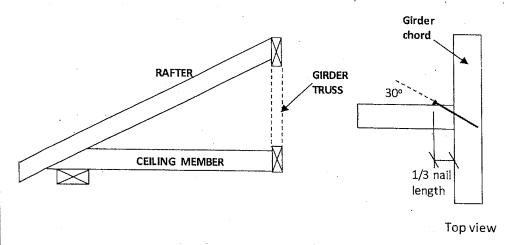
Toe-Nailing Rafter / Ceiling Member to Girder Truss
